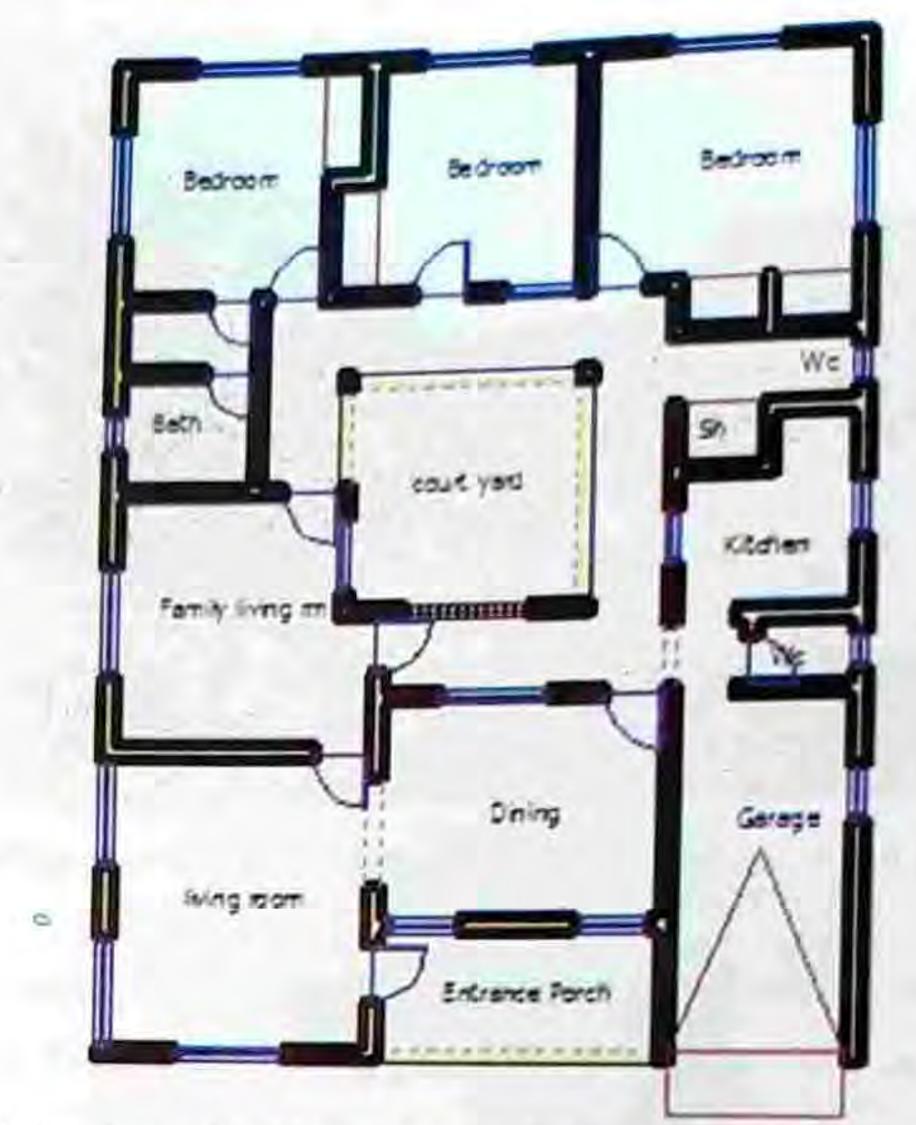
A typical 3 bedroom floor plan at Bosso Estate Minna:source authors survey 2011
